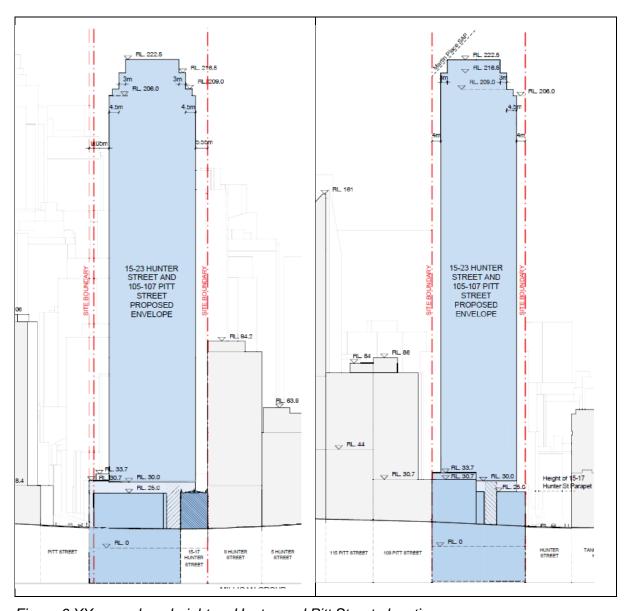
XX - envelope heights – Hunter and Pitt Street elevations
